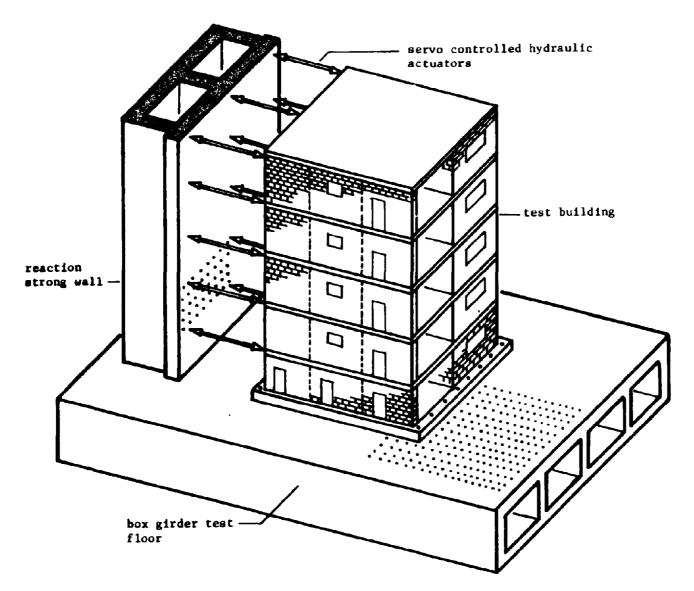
Schematic Test Setup for a Five Story Full Scale Building Test
